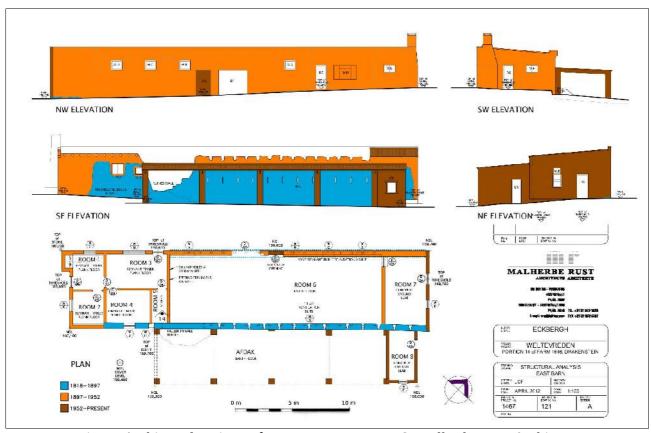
Architect drawings of East Barn structure. © Malherbe Rust Architects
